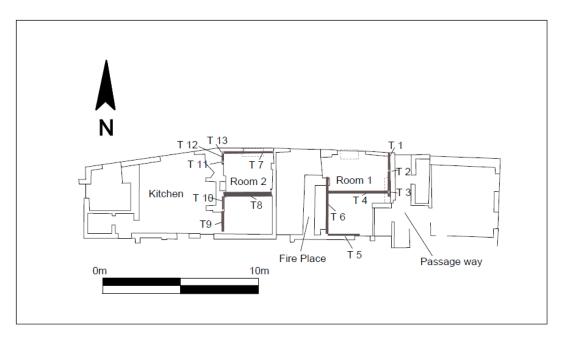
Location plan of timber elements found within Rooms 1 and 2 located at the rear of Knighton Hall.
